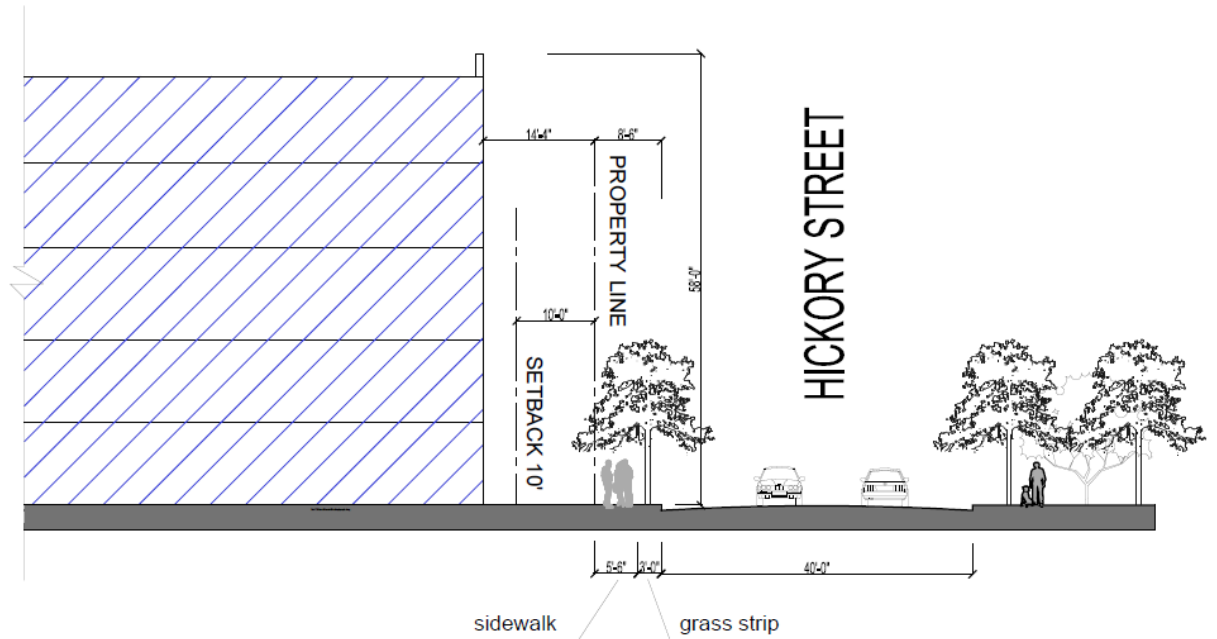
H Subarea C Conceptual Elevations
